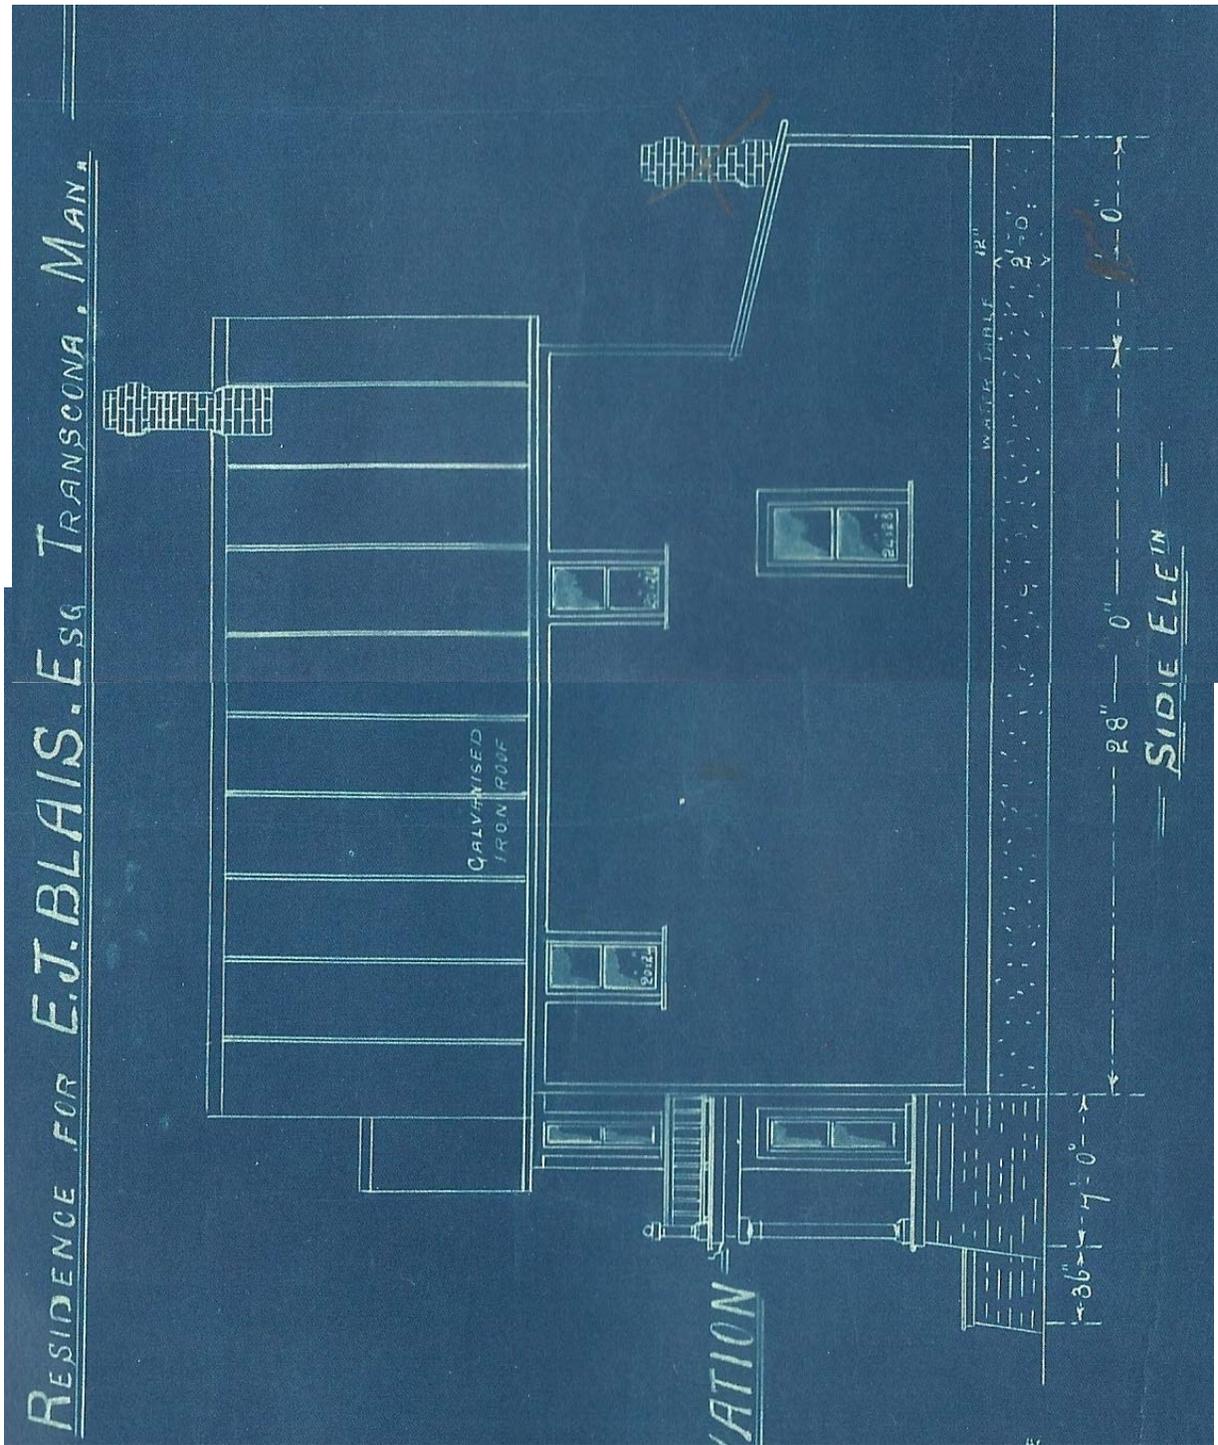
Architect's Plans, Blais House, "Side Elevation". (Courtesy of owner.)
